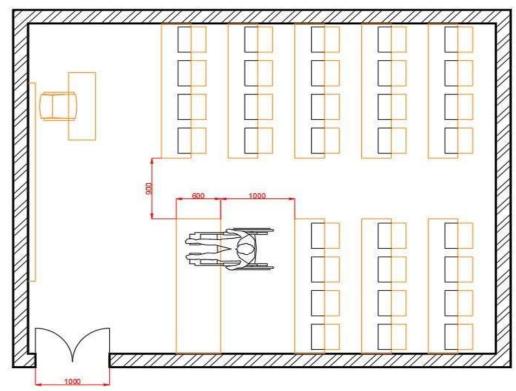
Classroom layout with dimensions of minimum space allocation for accessible seating
